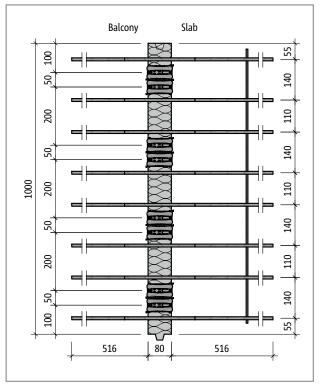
Schöck Isokorb® T type Q-E-V5: Product layout
